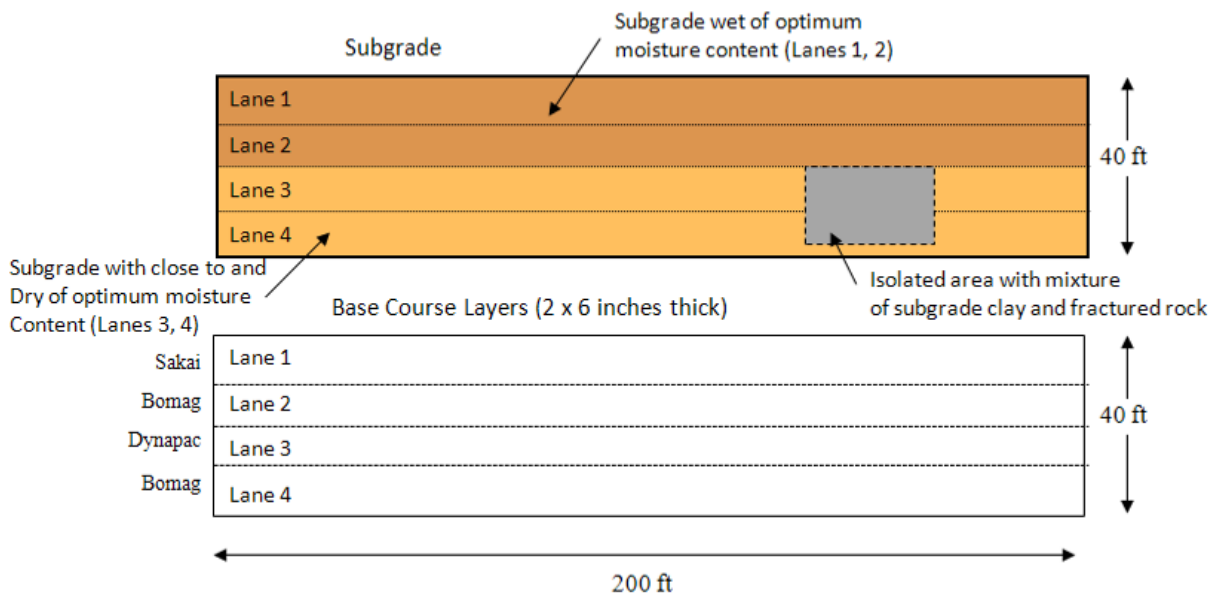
Plan view of test bed construction at the I-70 Maryland project
